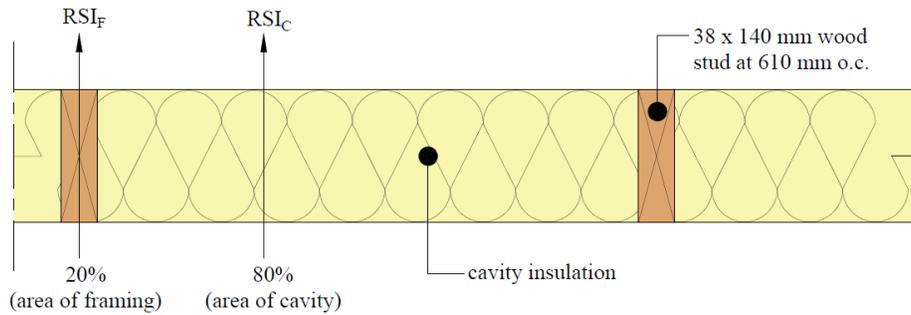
Example of 38 × 140 mm (2 × 6 in.) with 610 mm (24 in.) on Center Spacing Wood Frame Wall Assembly.
